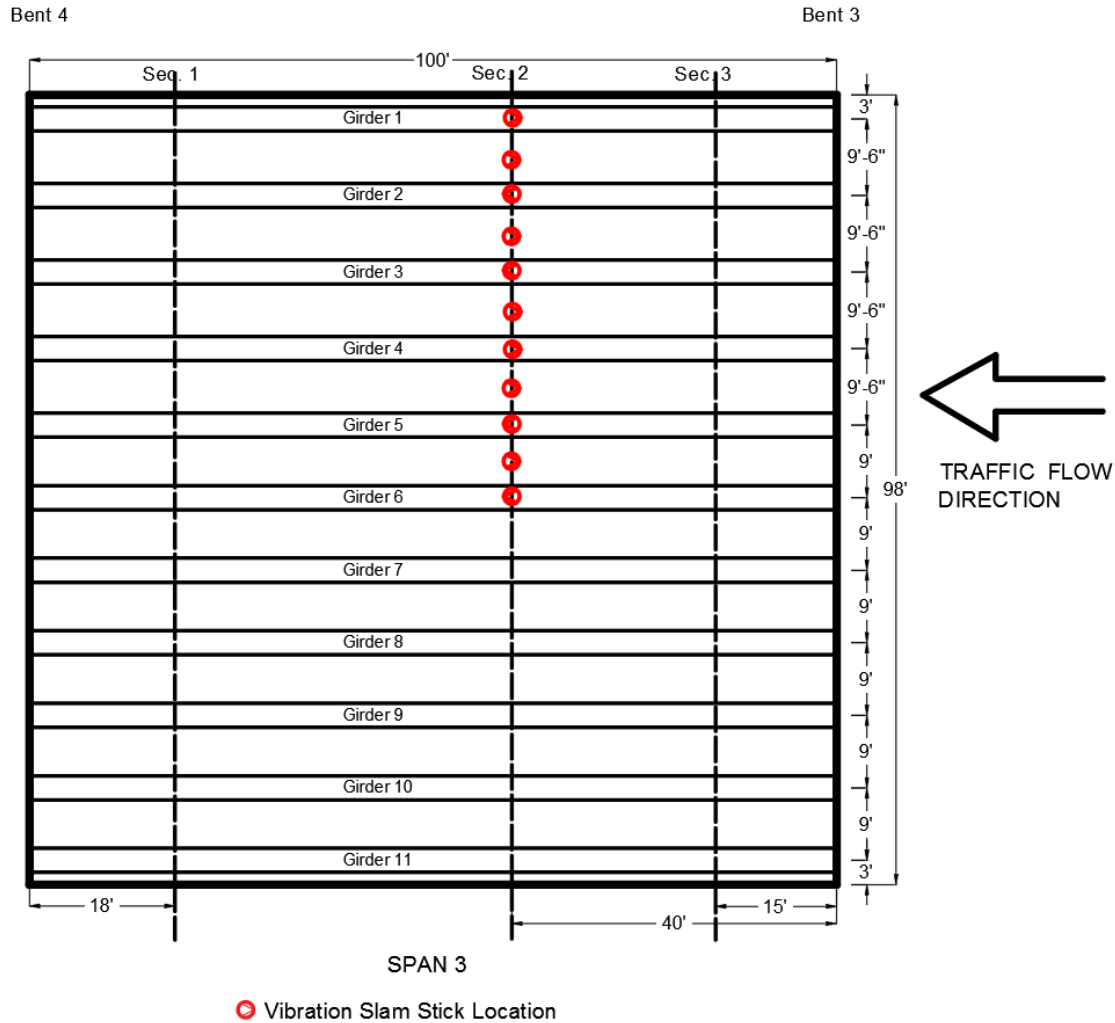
13: Locations of vibration meter under the deck and the girders for SB Bridge
